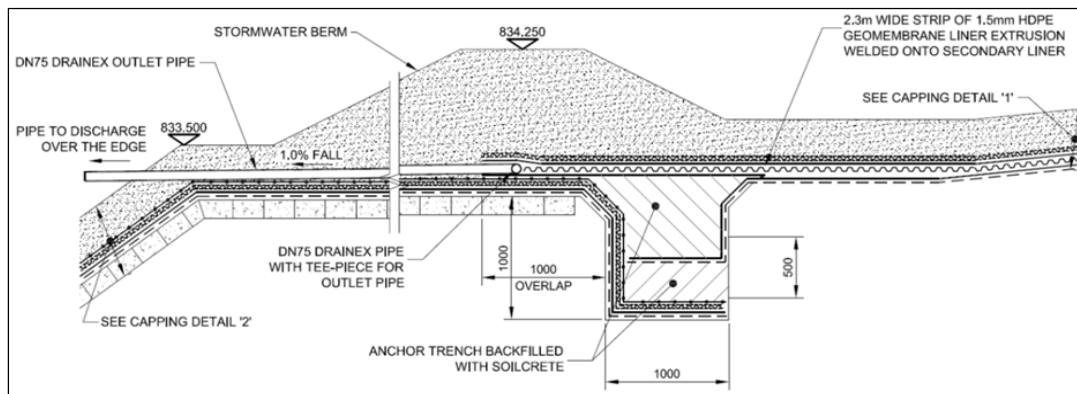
Cross section through leakage drainage collection and outlet pipe around perimeter.
